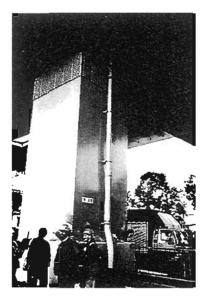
Hanshin Expressway - Damage to Rectangular Steel Pier Column stiffened walls buckled exposing orange coloured primer/undercoat
